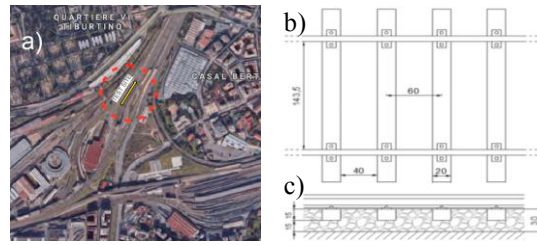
(a) location of the test-site; (b) plan-view of the inspected railway stretch; (c) cross-section of the track-bed.
